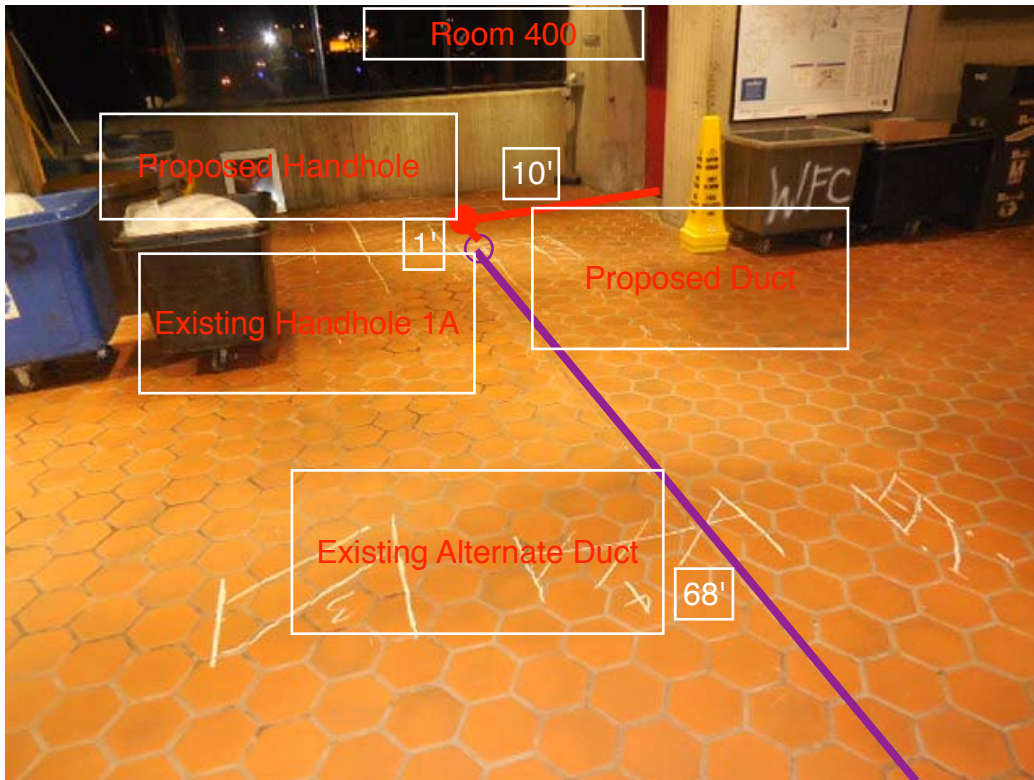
Existing / Proposed duct layout on mezzanine floor
